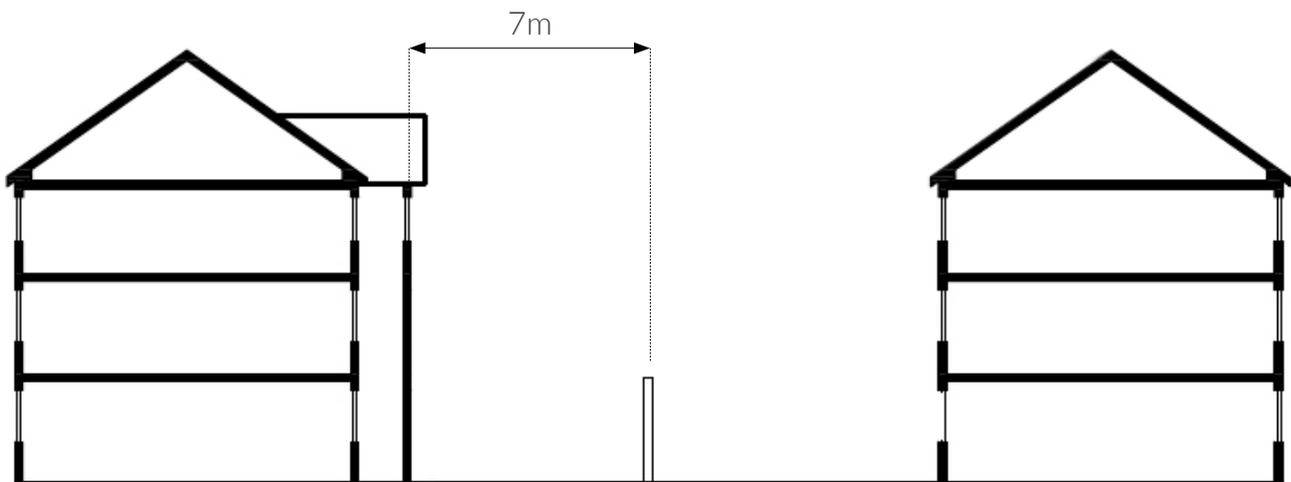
Any first floor proposed rear facing windows must be located no less than 7 metres from any facing boundary gardens.
